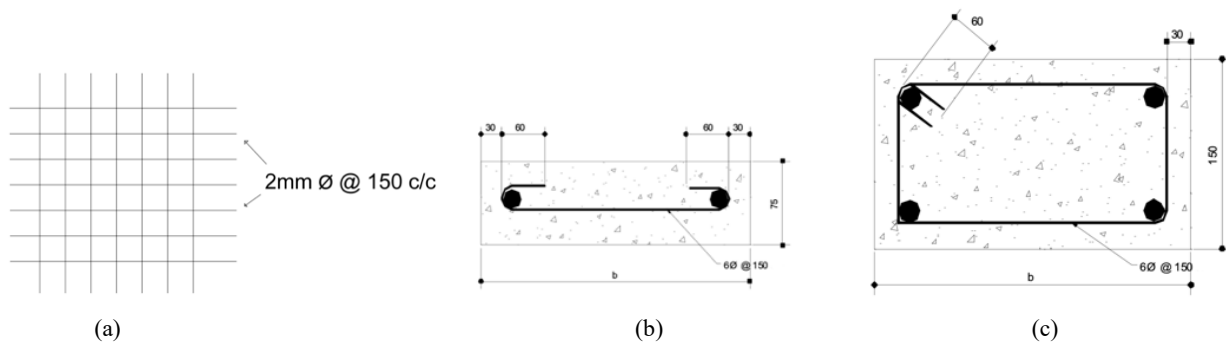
a) Gabion wire reinforcement detail, b) Sill and Roof bands detailing [20], c) Lintel band [20].
